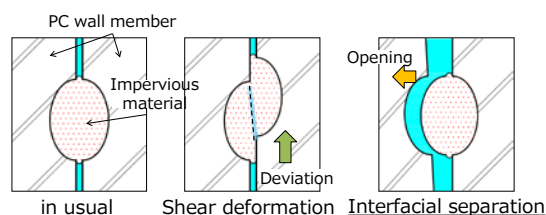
Deformation of impervious material filled between PC wall members (Plan view, see Fig.2 for overall figure of PC wall members)
